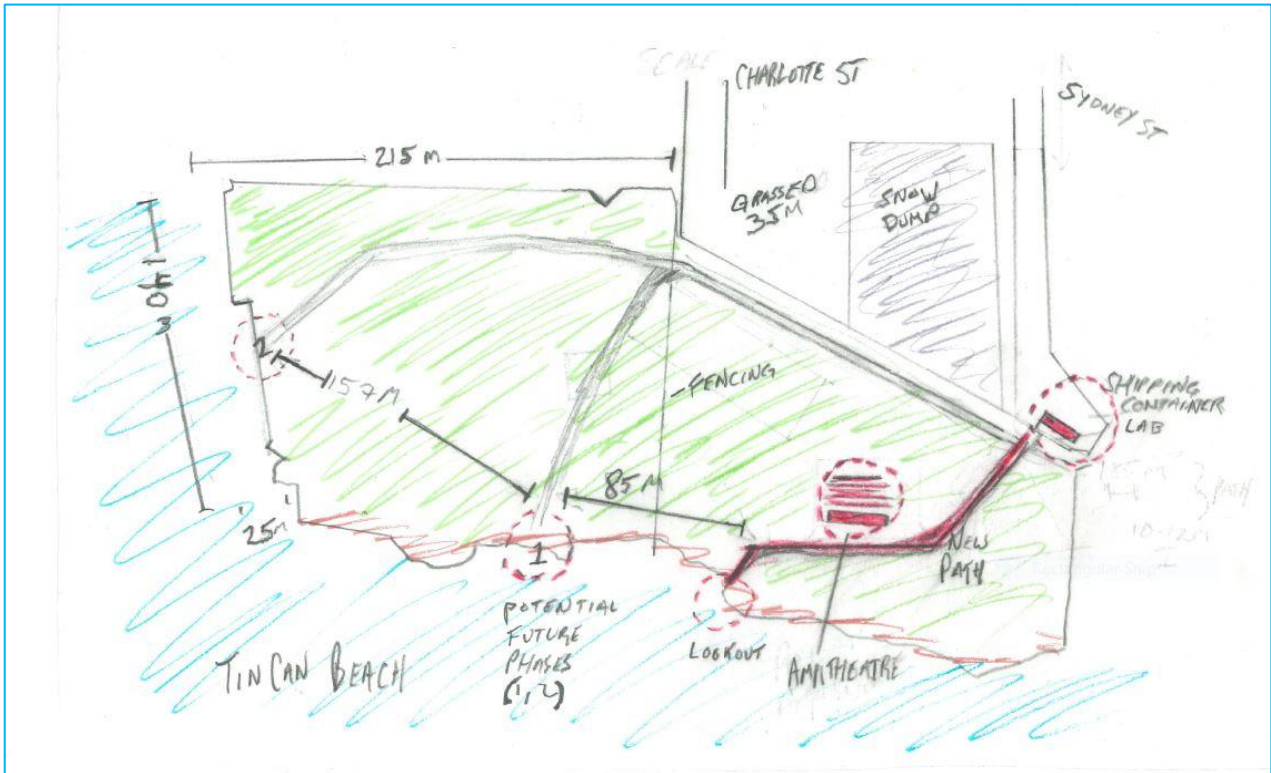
Proposed Tin Can Beach Restoration Site Plan
